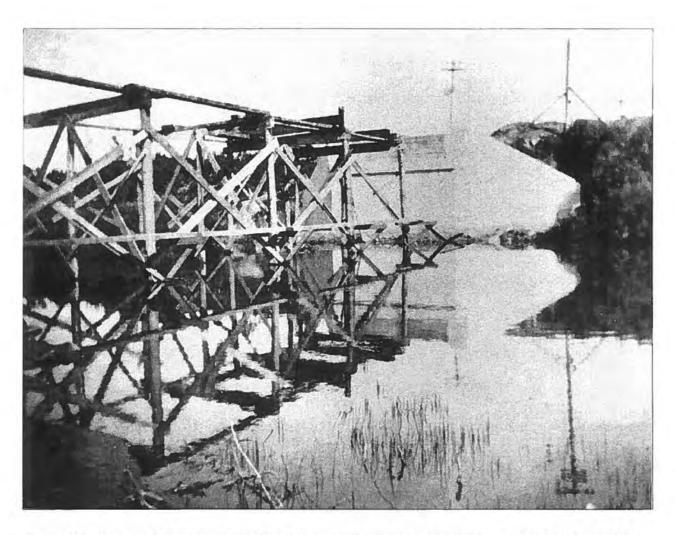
Falsework for truss with 100-foot span; Greenwood, Clark County, 1924; Elkhart Bridge Company. (Source: Willis E. Gifford, Jr.).
